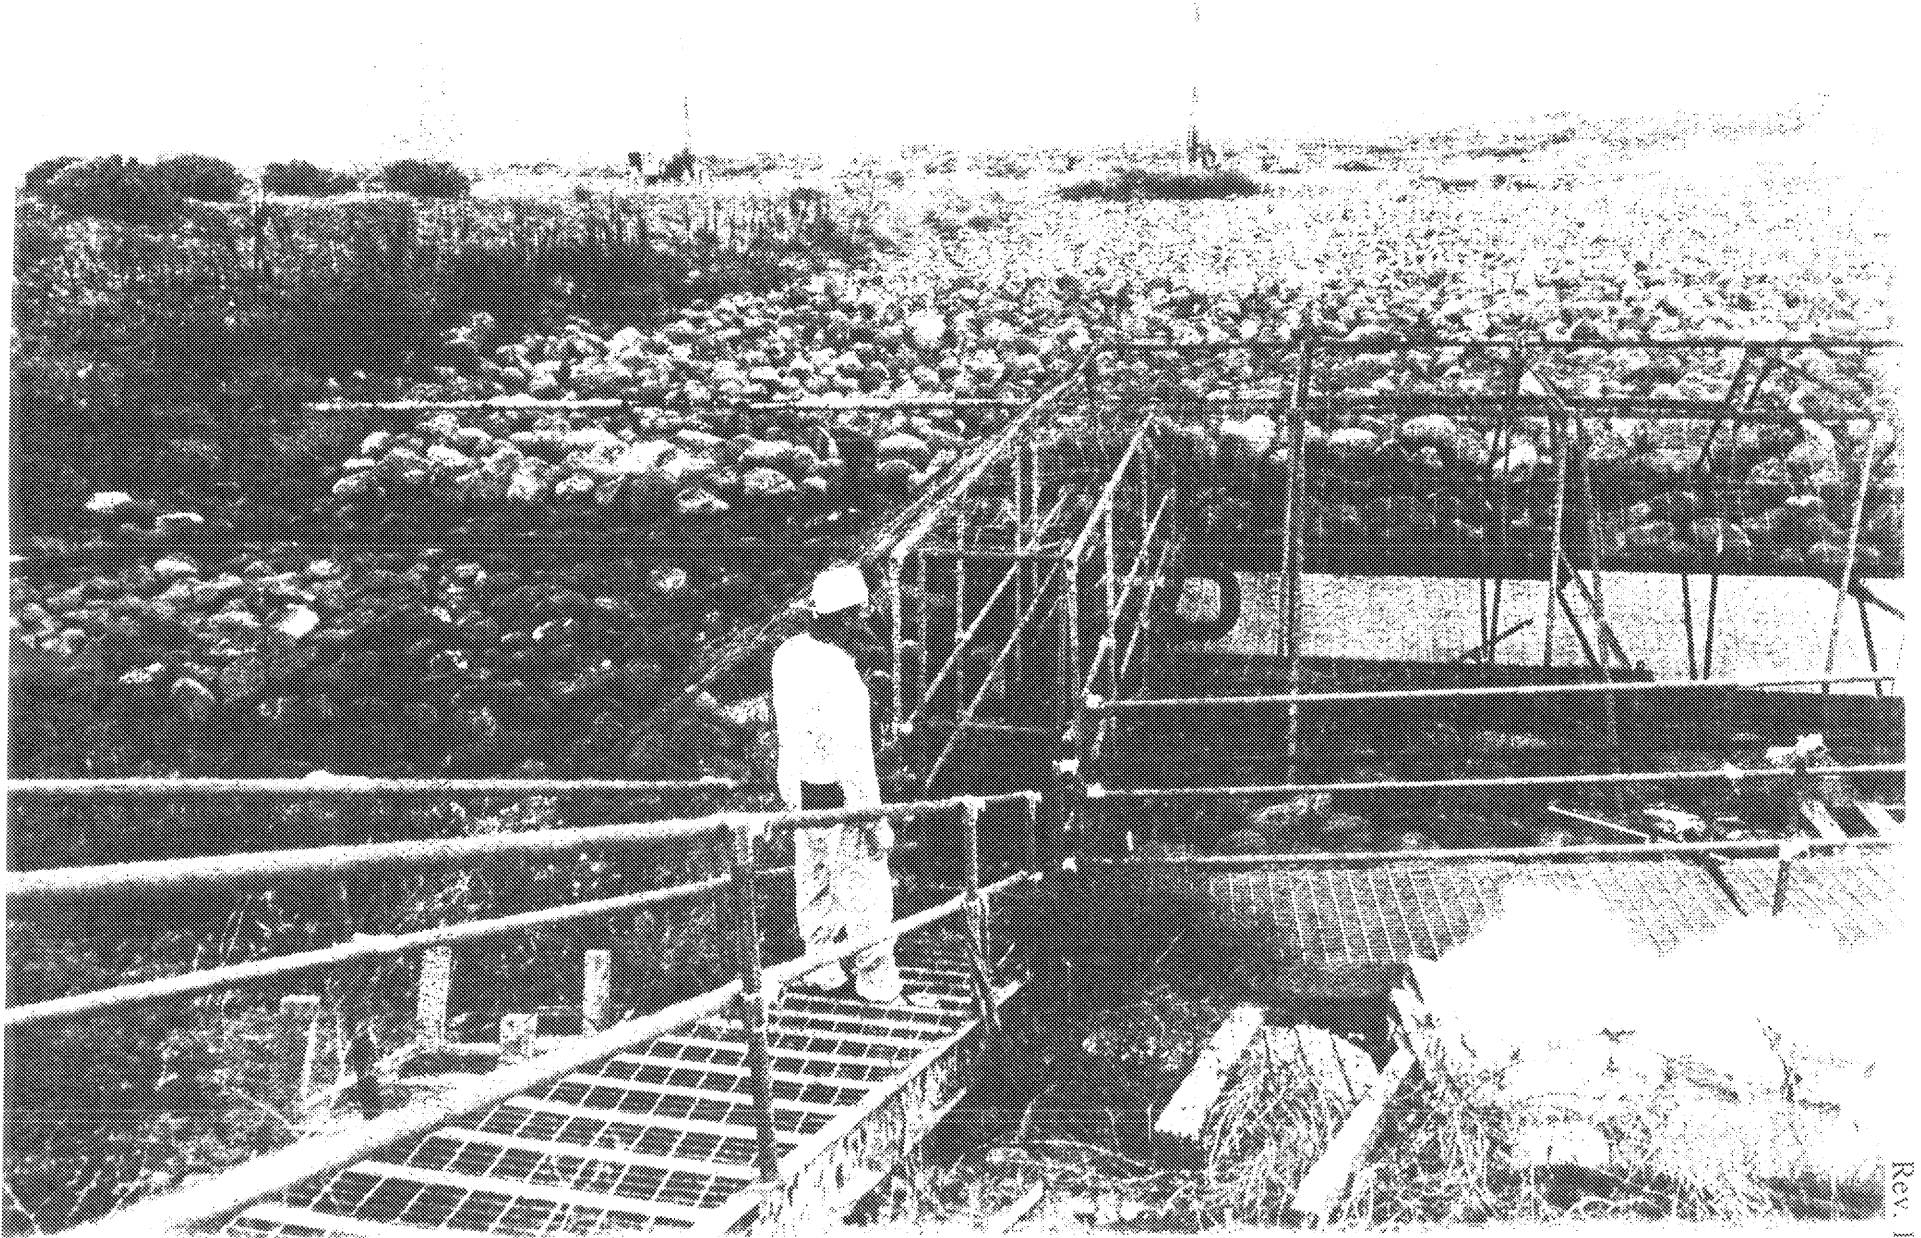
1301-N Oib. Capped End Pipe Southeast Corner Looking North (3/6/95)
